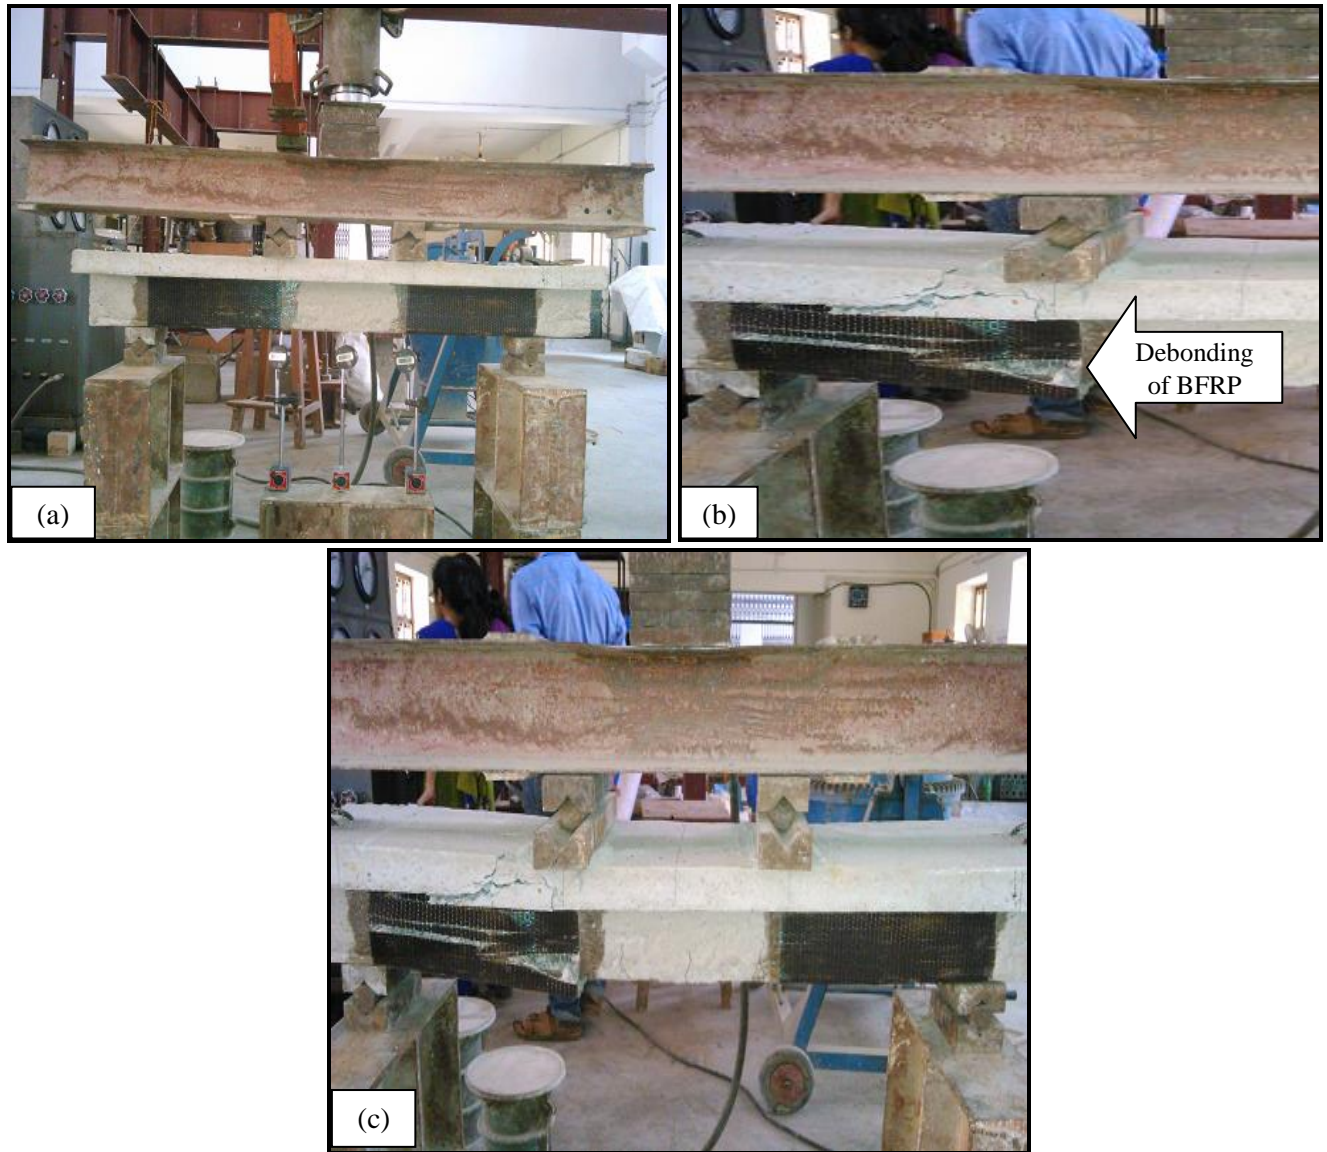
(a) Experimental Setup of beam SB1 under four-point loading system, (b) Debonding of BFRP sheet at ultimate load, (c) Ultimate failure of beam SB1 by debonding of BFRP sheet followed by diagonal shear crack
